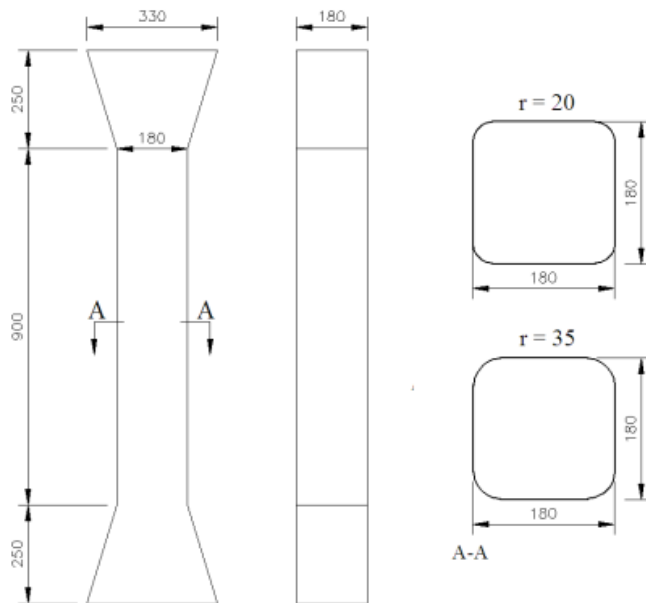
Overall dimensions of concrete columns and their cross-section.
